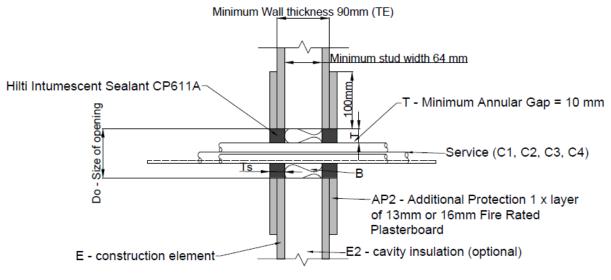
AS 1530.4:2014 D1 Standard Cable Sets, Side View, Seal type 4
